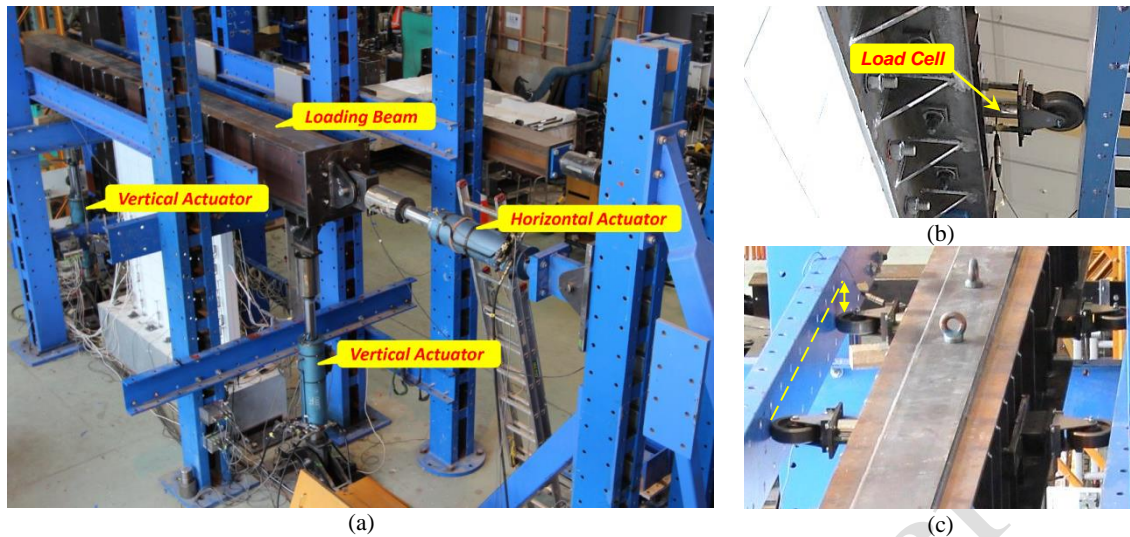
Test setup: (a) configuration of the actuators; (b) connection details of the loading beam and the roller supports; (c) roller supports positioned on both sides at different elevations of the loading beam
